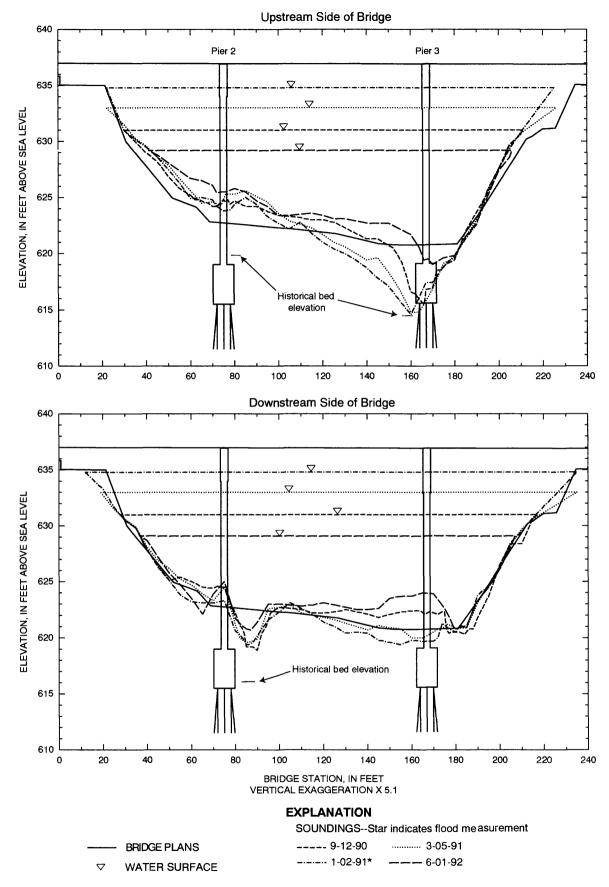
Cross sections showing bed elevations from bridge plans and soundings, U.S. Route 41 (southbound lane) over Kankakee River at Schneider, Indiana.
